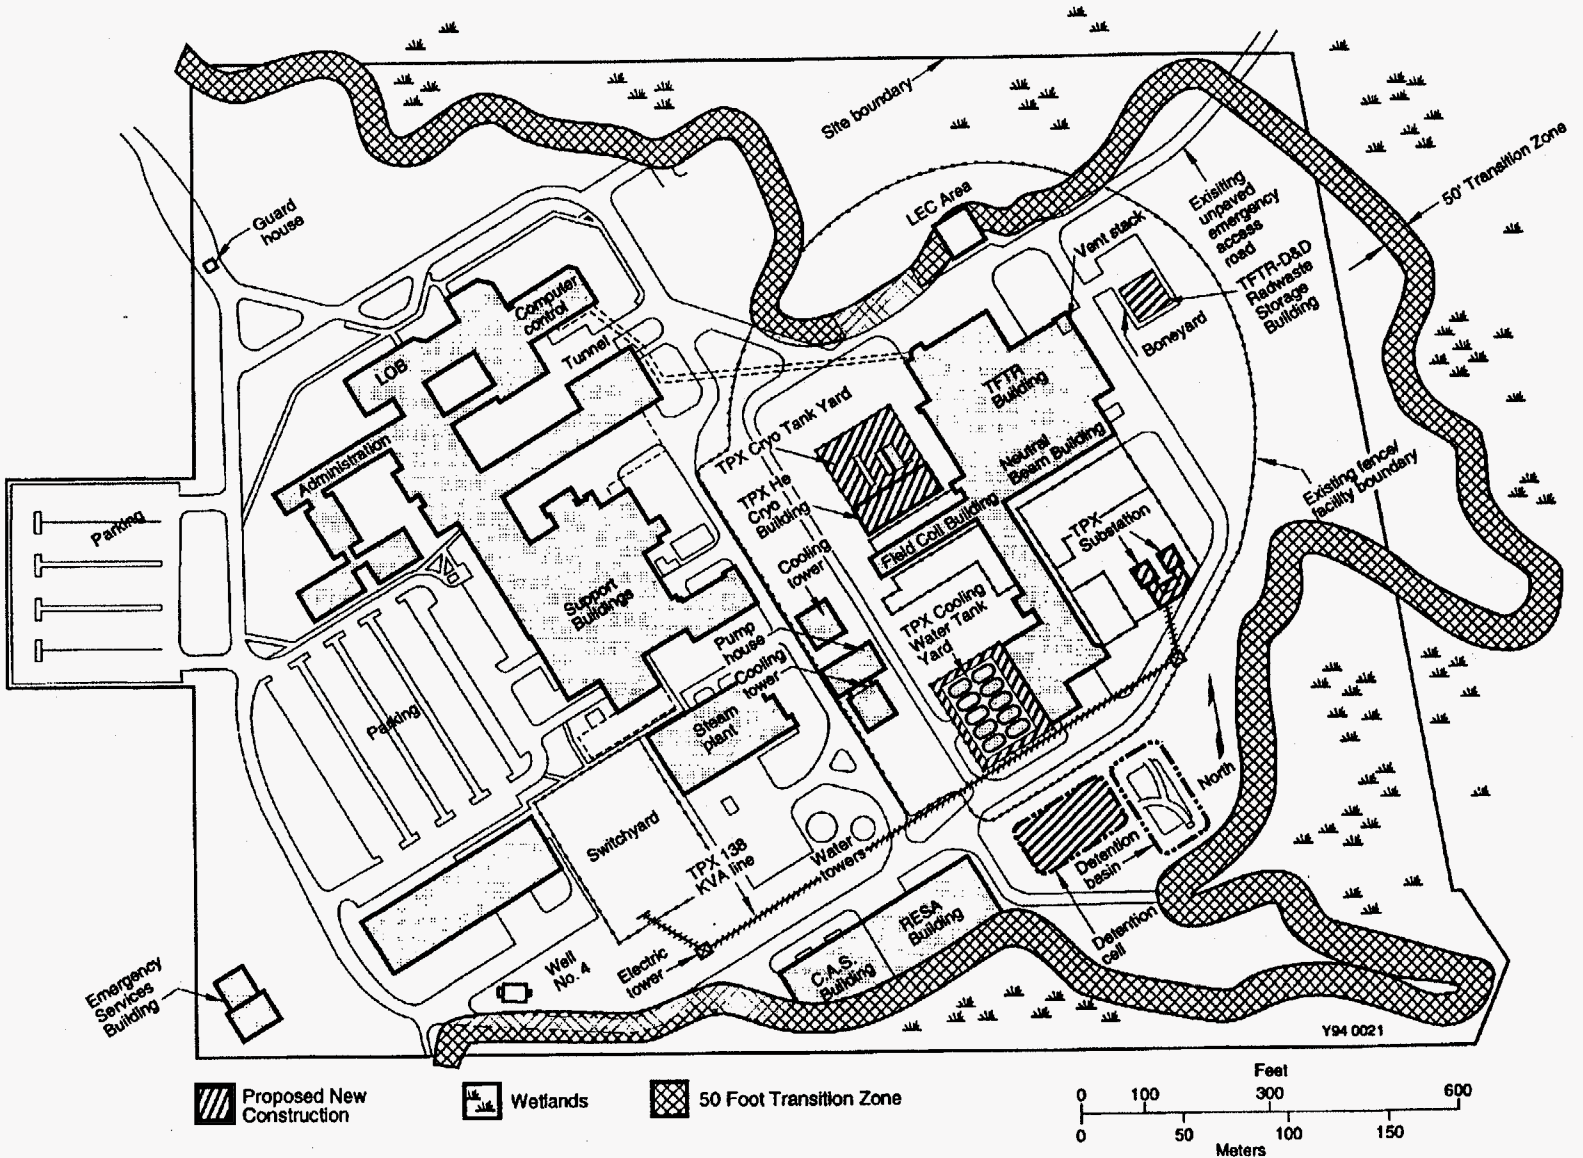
General PPL site plan with proposed new construction and wetlands location relative to PPL facilities.
